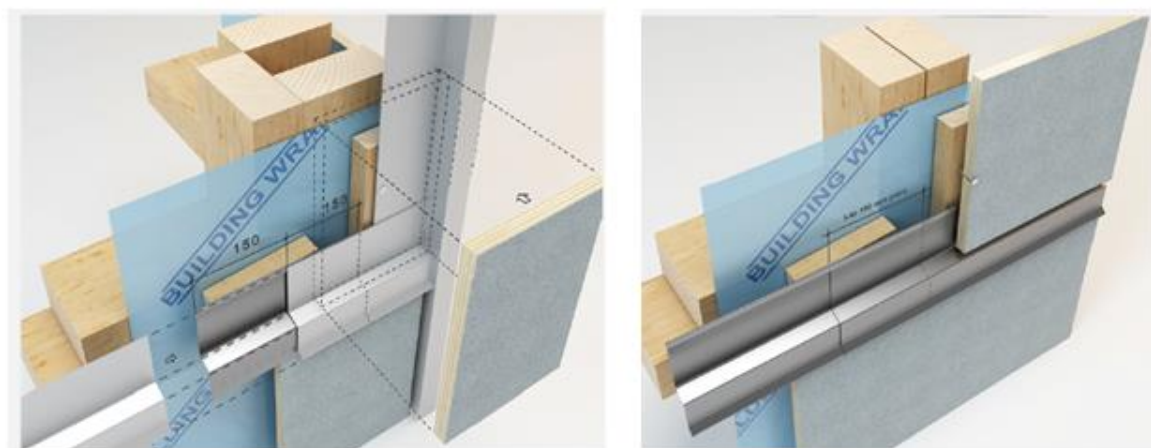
Illustrations of installing wood panels for facade cladding (“Shadowclad® Exterior Plywood » Plywood NZ,” 2021)
